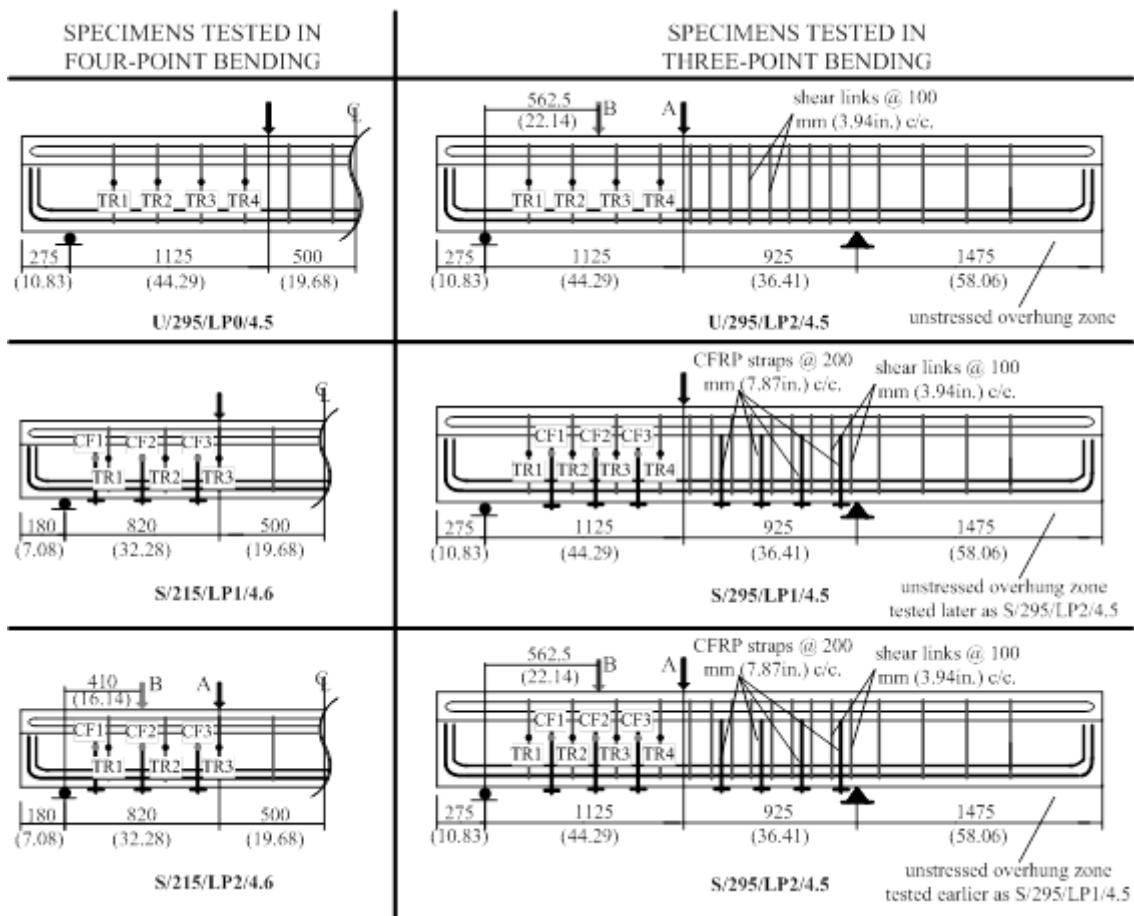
Details of test specimens and loading patterns – dimensions in mm (in.).
